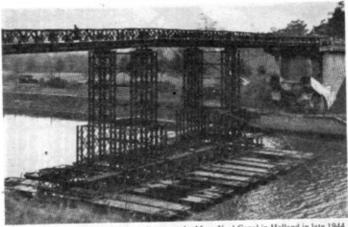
A high level floating Bailey built across the Maas-Vaal Canal in Holland in late 1944 Note the extensive use of Bailey for piers and substructure.
